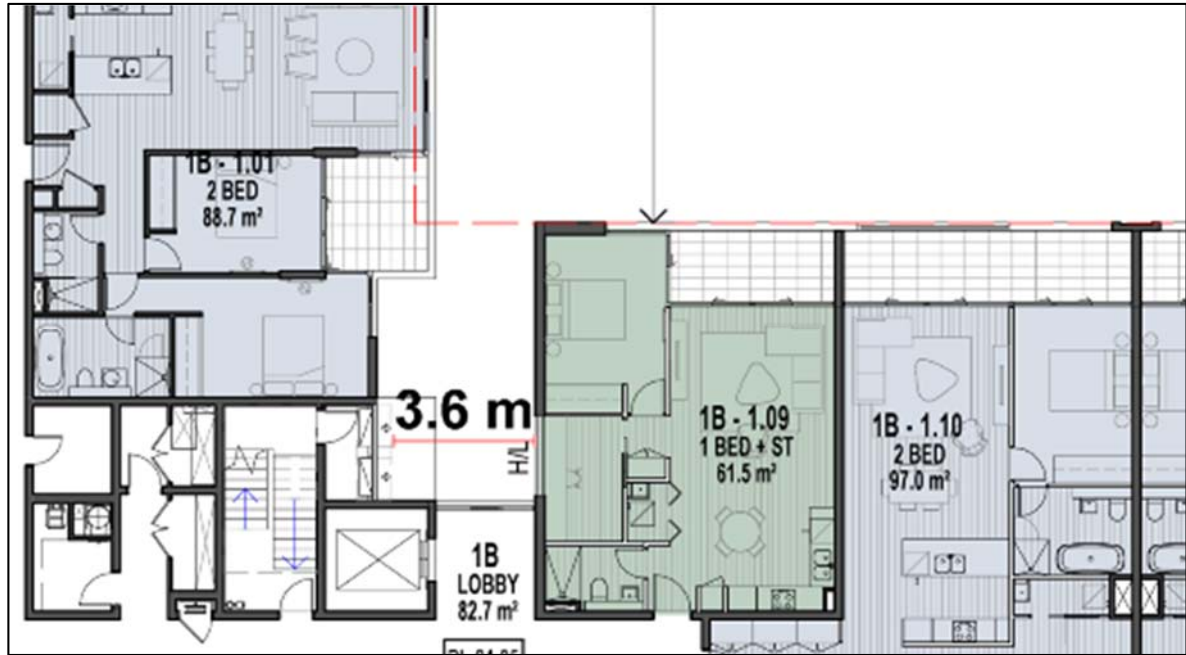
Building 1B Study window are in close proximity to banks of air conditioner units
